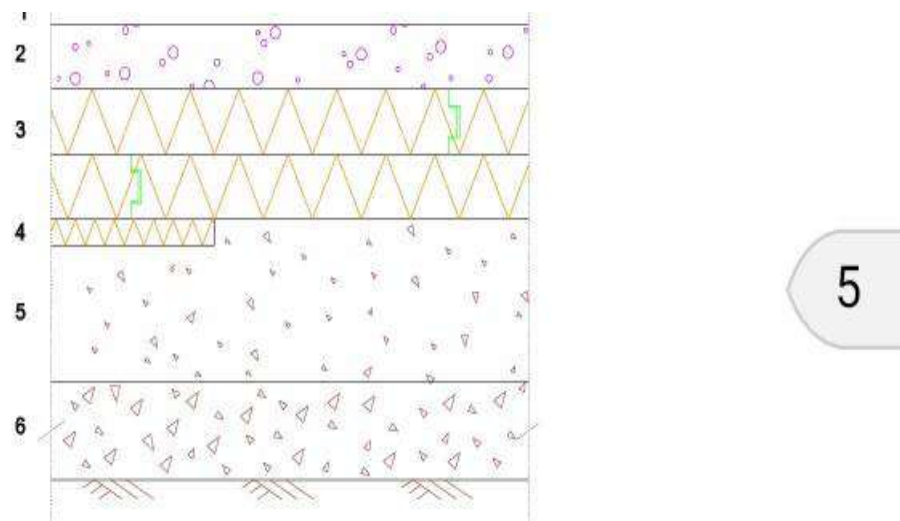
Section ZEB's floor: 1 - flooring; 2 - floor cement screed; 3 - slabs SPU AL 100 + 100 mm; 4 - slabs SPU AL 40; 5 - foundation slab; 6 - pebble dash .
